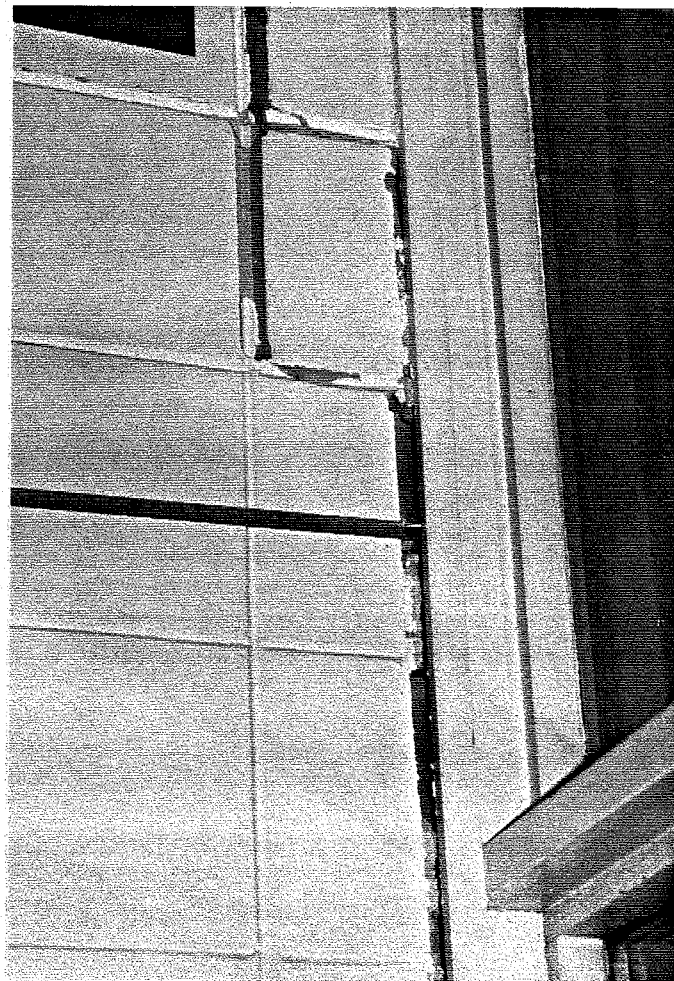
Close-up of cracking in masonry partition wall.
